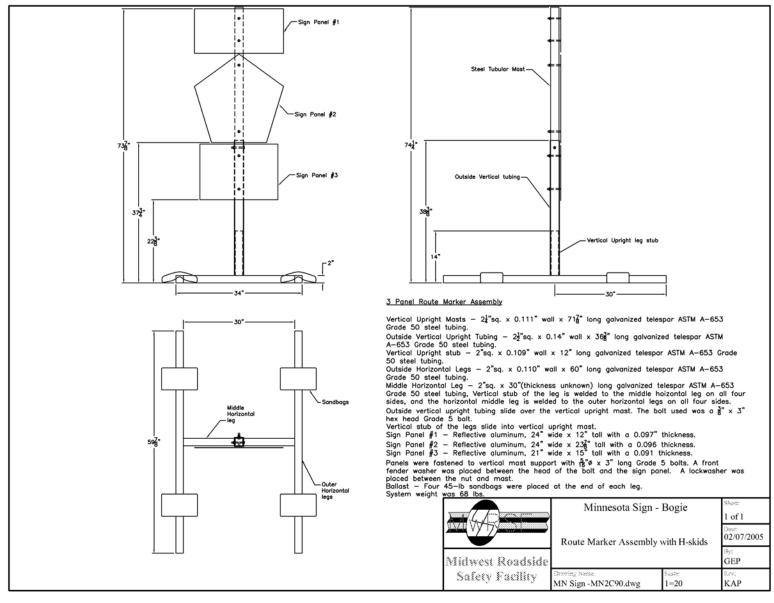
Route Marker Assembly System Design Details, Bogie Test MN2C-90
